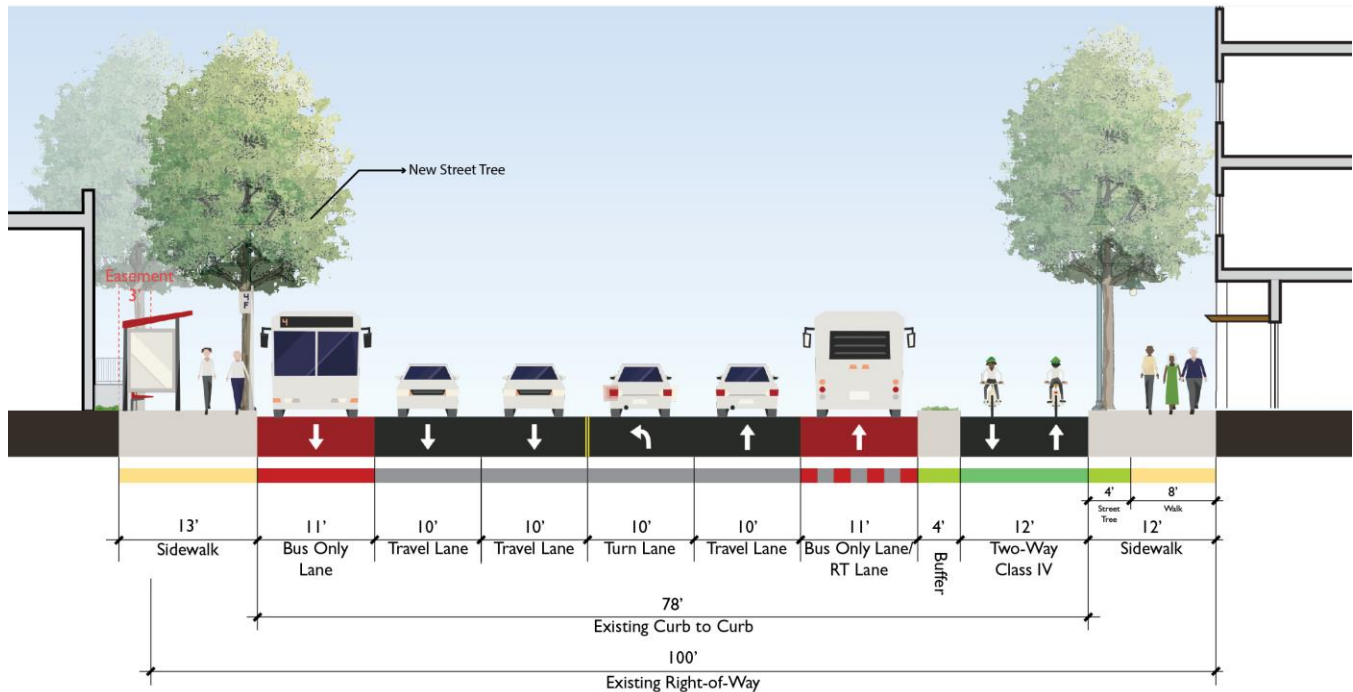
40th Street at eastbound bus stop located at Horton Street (looking west) – SECTION H
